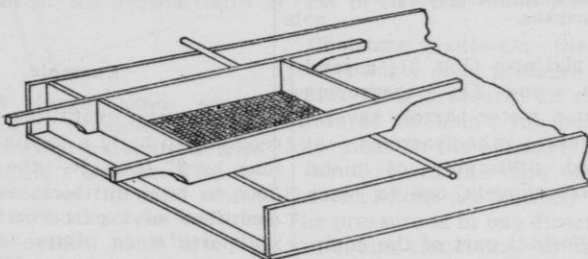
Permanent mixing platform. The platform should be about 12 feet long by 7 feet wide, and built of 2 inch plank placed on three 4x4 stringers, rounded at the ends, the outer ones projecting a short distance beyond the platform and bored for clevis pins, so that the platform may be readily drawn about the farm.
